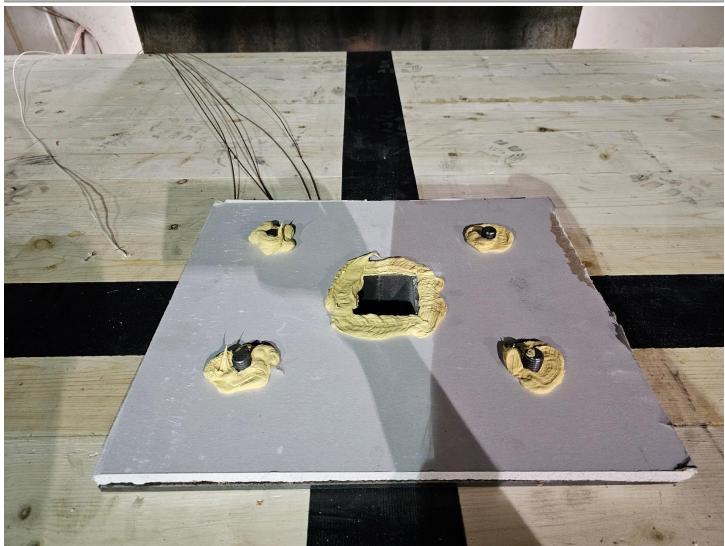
Unexposed Side Steel Plate Connection Finished with Gypsum Board and Fire Caulking
